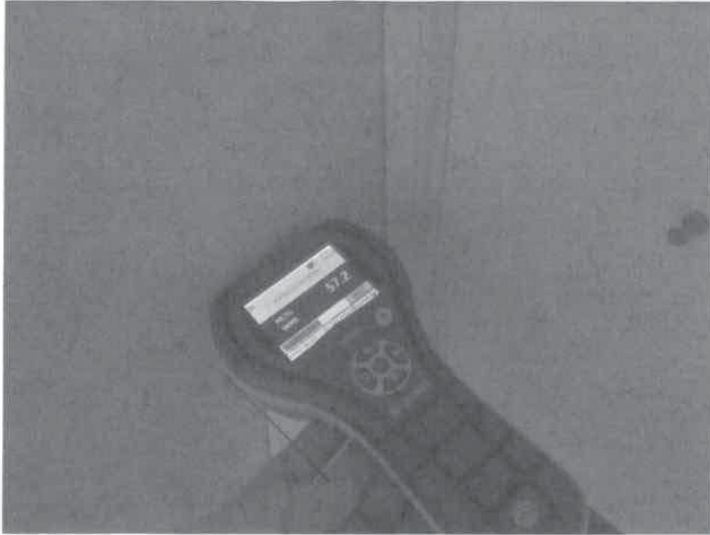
Elevated moisture level about a foot from the base of the wall under the window outside of the women's restroom
